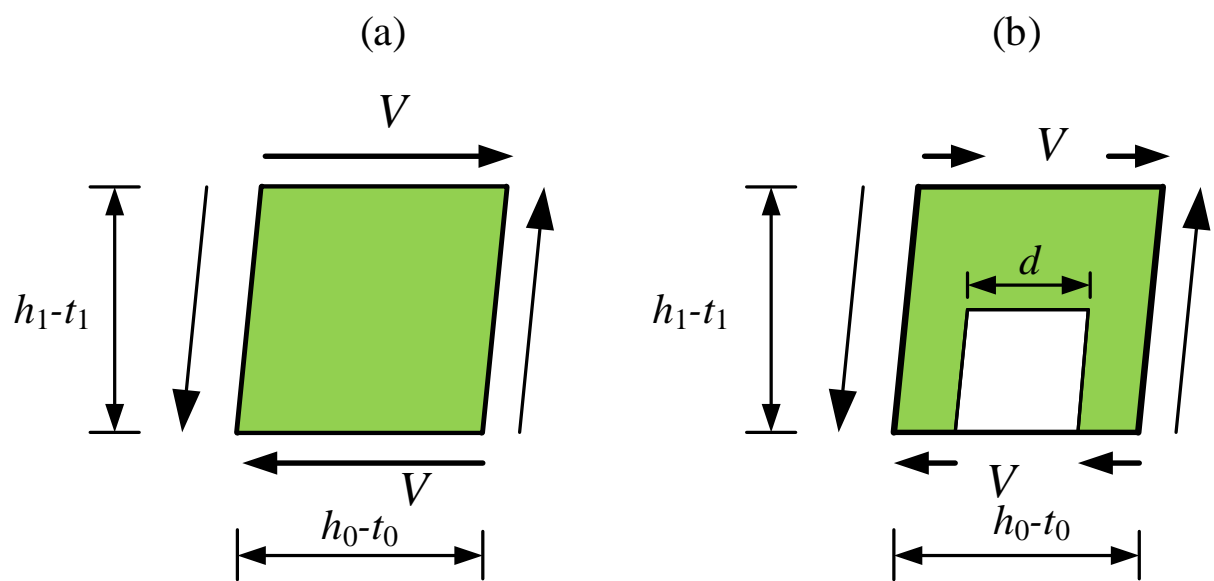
Model of the cws component: (a) without hole; (b) with hole.
